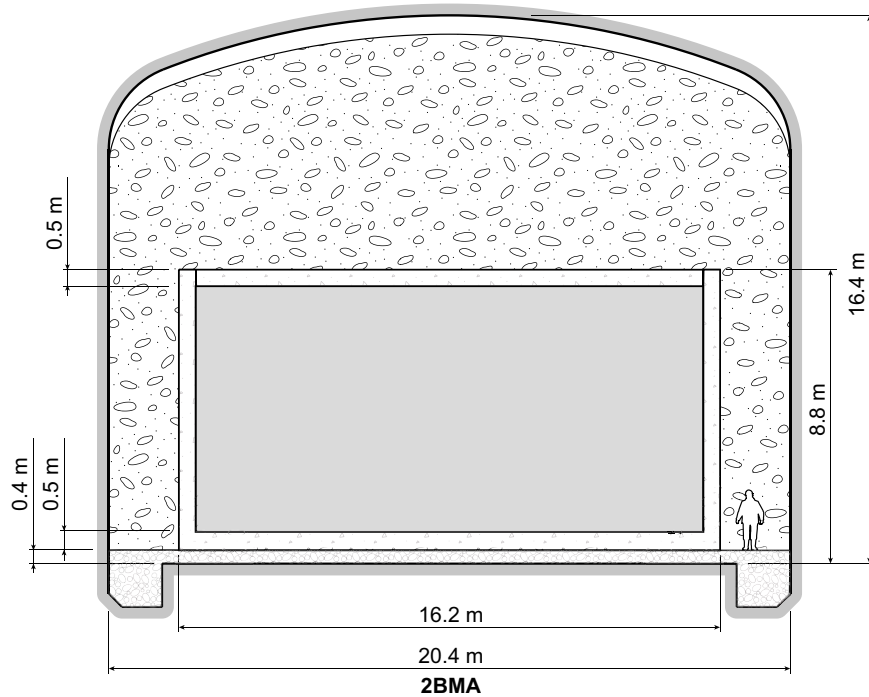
Schematic cross-section of 2BMA after closure. Note that the figure shows Layout 2.0; Layout 1.5 is used in SR-PSU modelling. The concrete structure has the same dimensions in Layout 1.5, but the width of the vault is 19.8 m and the height is 16.8 m. The dimensions of 2BMA are given in detail in Table 5-1.
